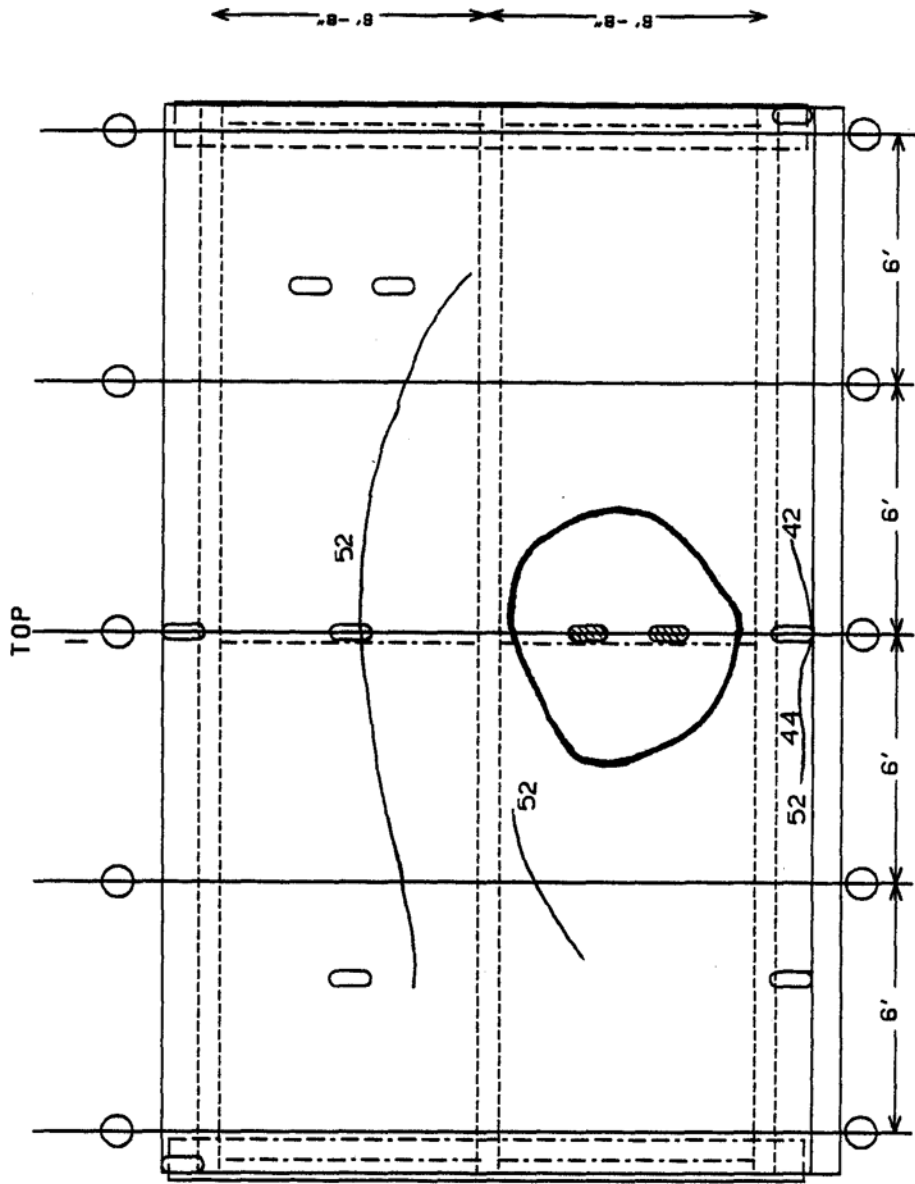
Top Cracking Pattern (First Bridge - Test No. 4)
